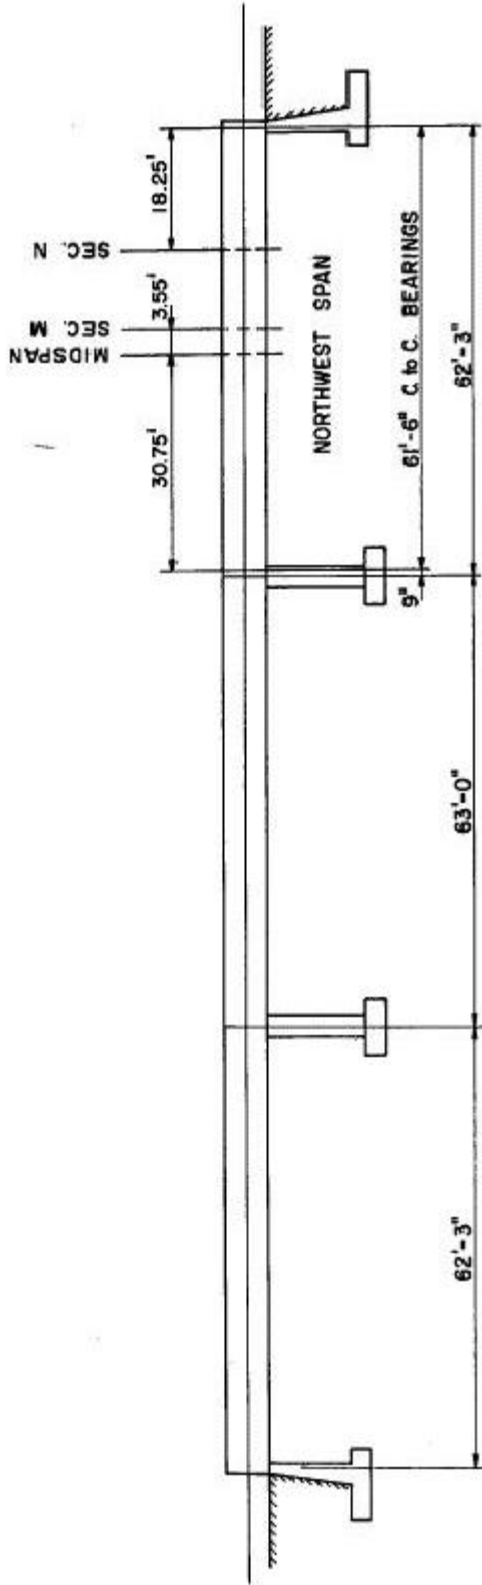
Elevation of Derhersville Bridge (Douglas 1966)
